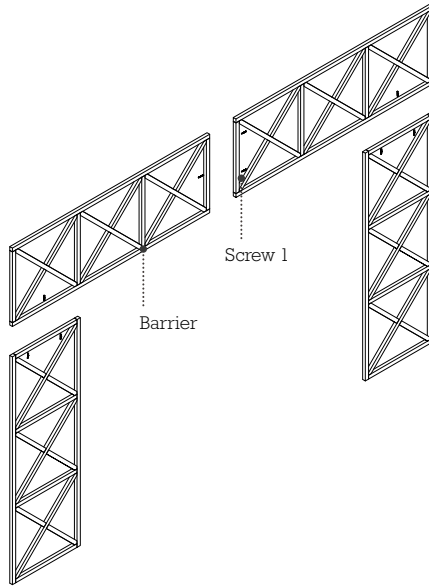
Construction detail - Outfitting structure | Axonometric view.
